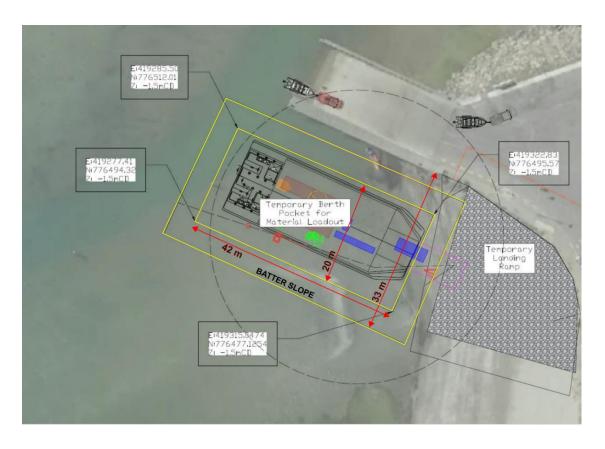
Plan of proposed barge load-out facility adjacent to Akaroa public boat ramp with approximate dimensions overlaid. Source: Enviser Ltd.
